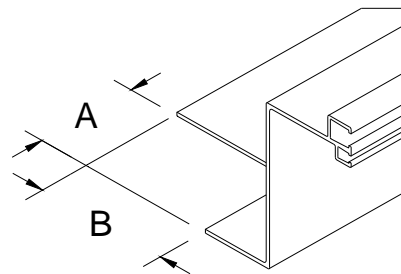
"Z" Shaped Lintel Seal Cutout
